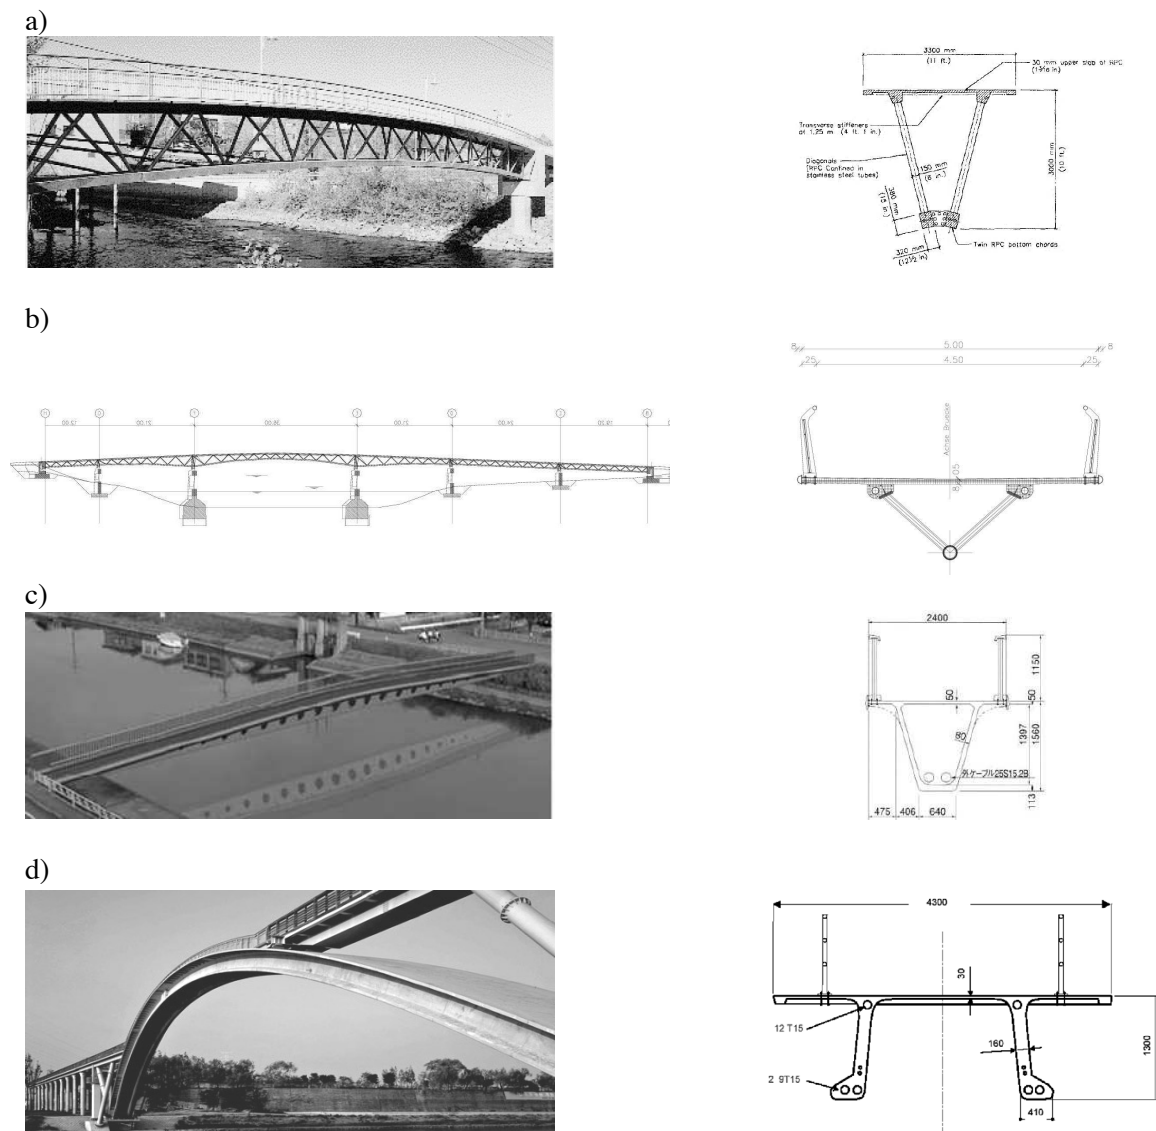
UHPFRC footbridges: a) Sherbrooke footbridge (1997, Canada); b) Gärtnerplatz footbridge (2007, Kassel, Germany); c) Sakata-Mirai footbridge (2002, Japan); d) Seonyu footbridge (2002, Seoul, Korea)
